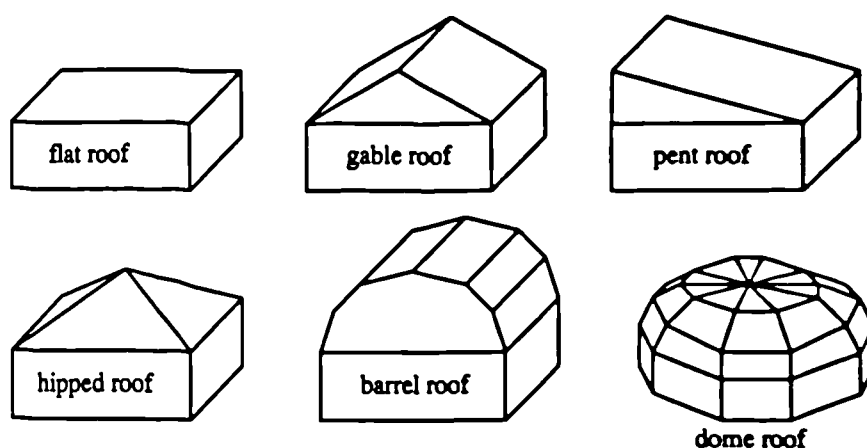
Possible room and roof shapes used by the solar distribution program SUNSIM.
